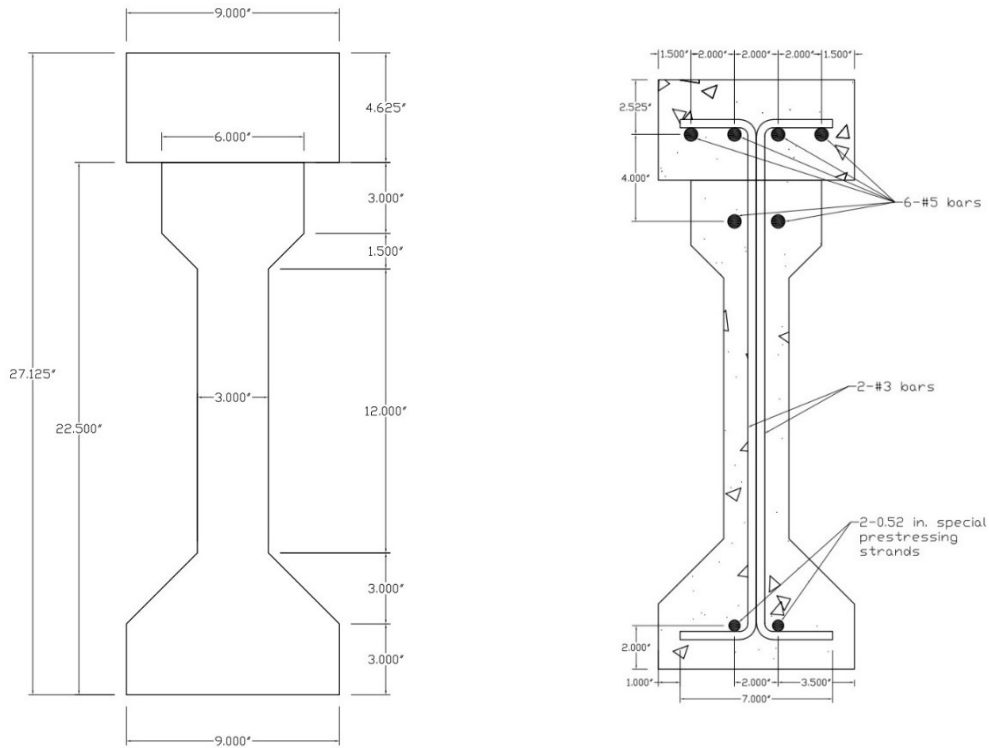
Girder Dimensions (Left) and Stirrup Dimensions (Right)
